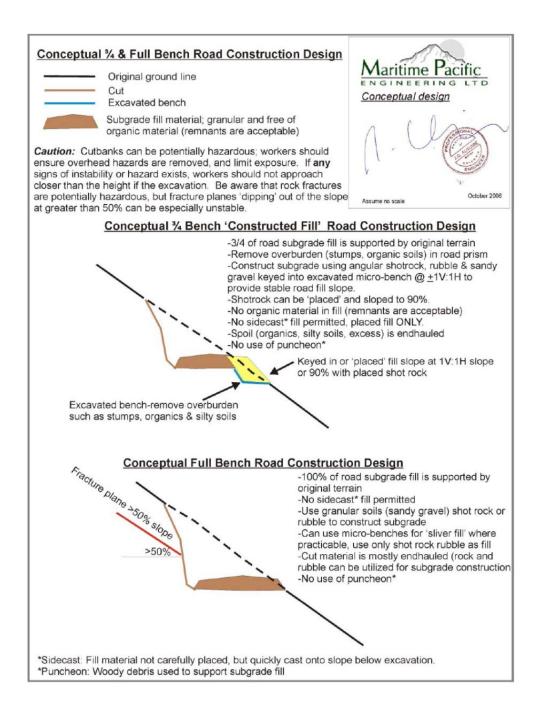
Conceptual road design showing typical ³/₄ and full bench road construction
